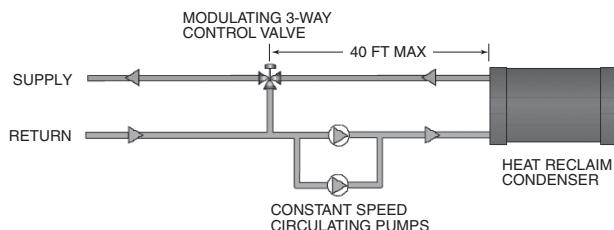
A — Three-Way Head Pressure Control Valve Location (Preferred)
